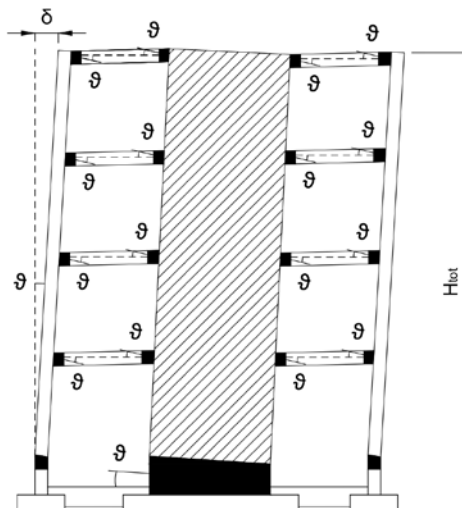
Typical collapse mechanism for a dual wall-frame system (adapted and redrawn from Fardis, M. N. (2009)).
